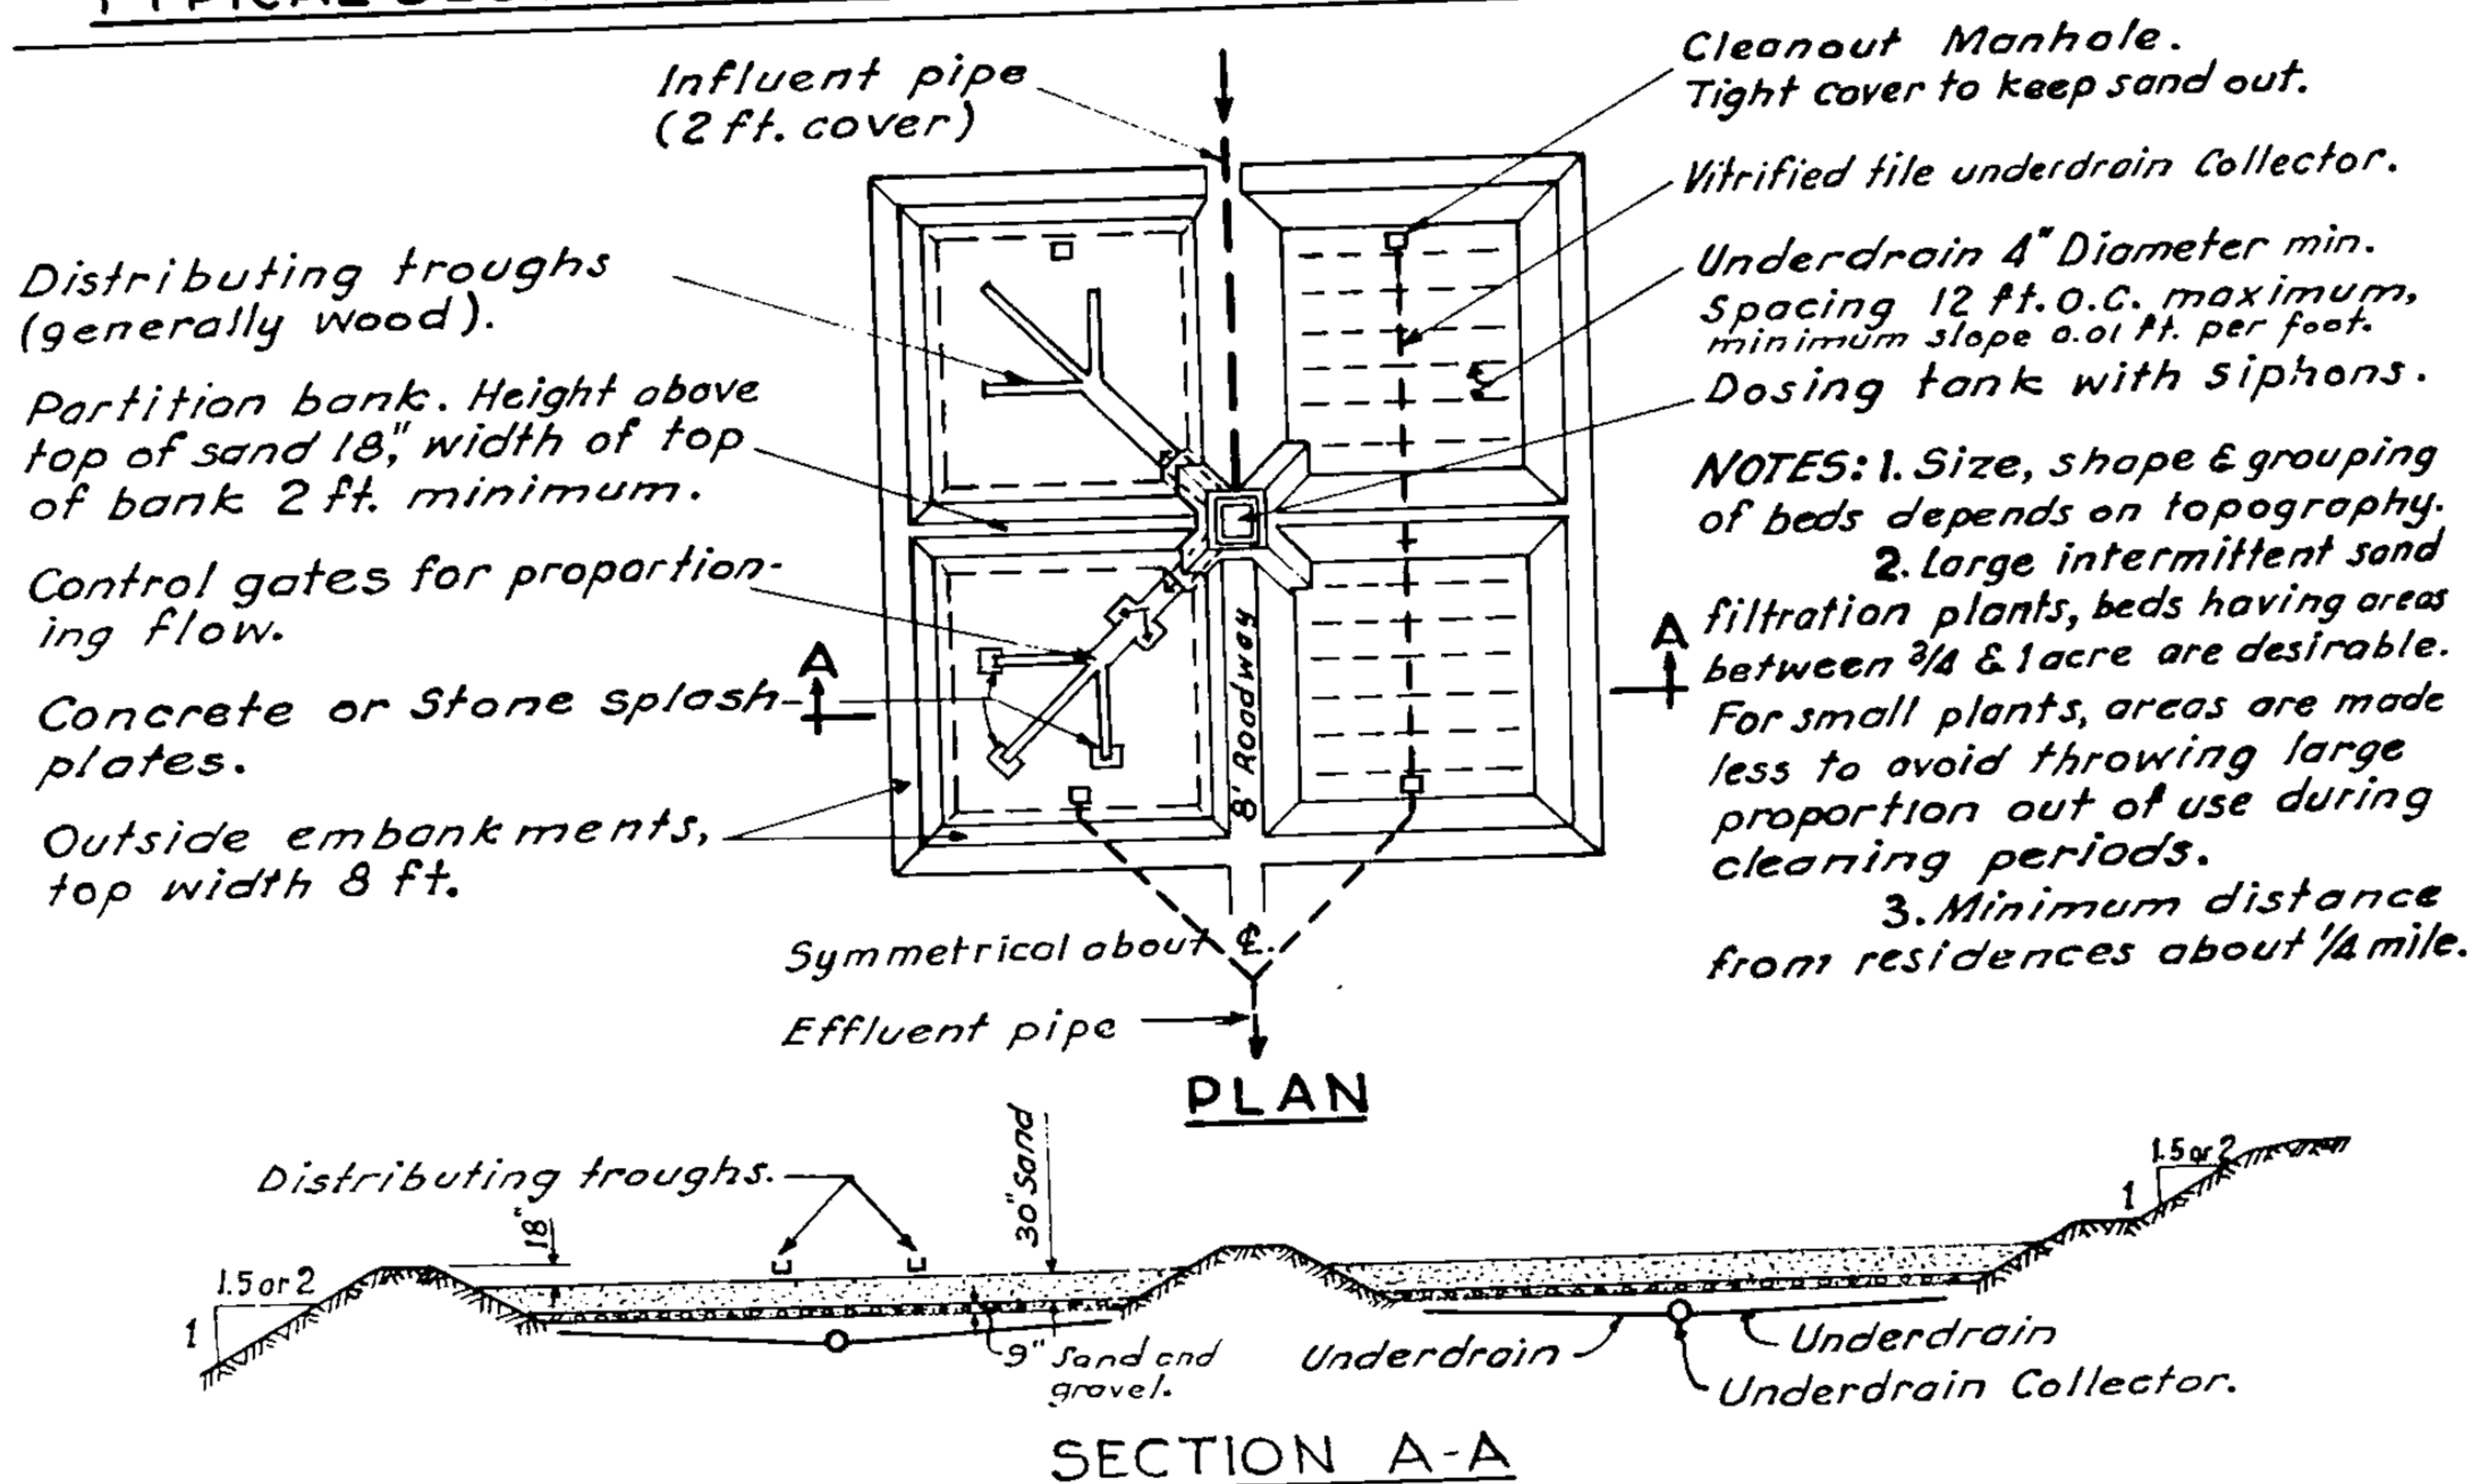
FIGURE B - TYPICAL LAYOUT OF SAND FILTERS.
